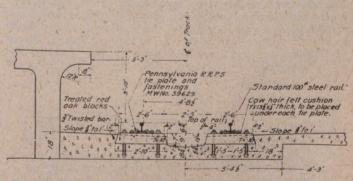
CONCRETE TRACK CONSTRUCTION AT PENNSYLVANIA TERMINAL, NEW YORK
